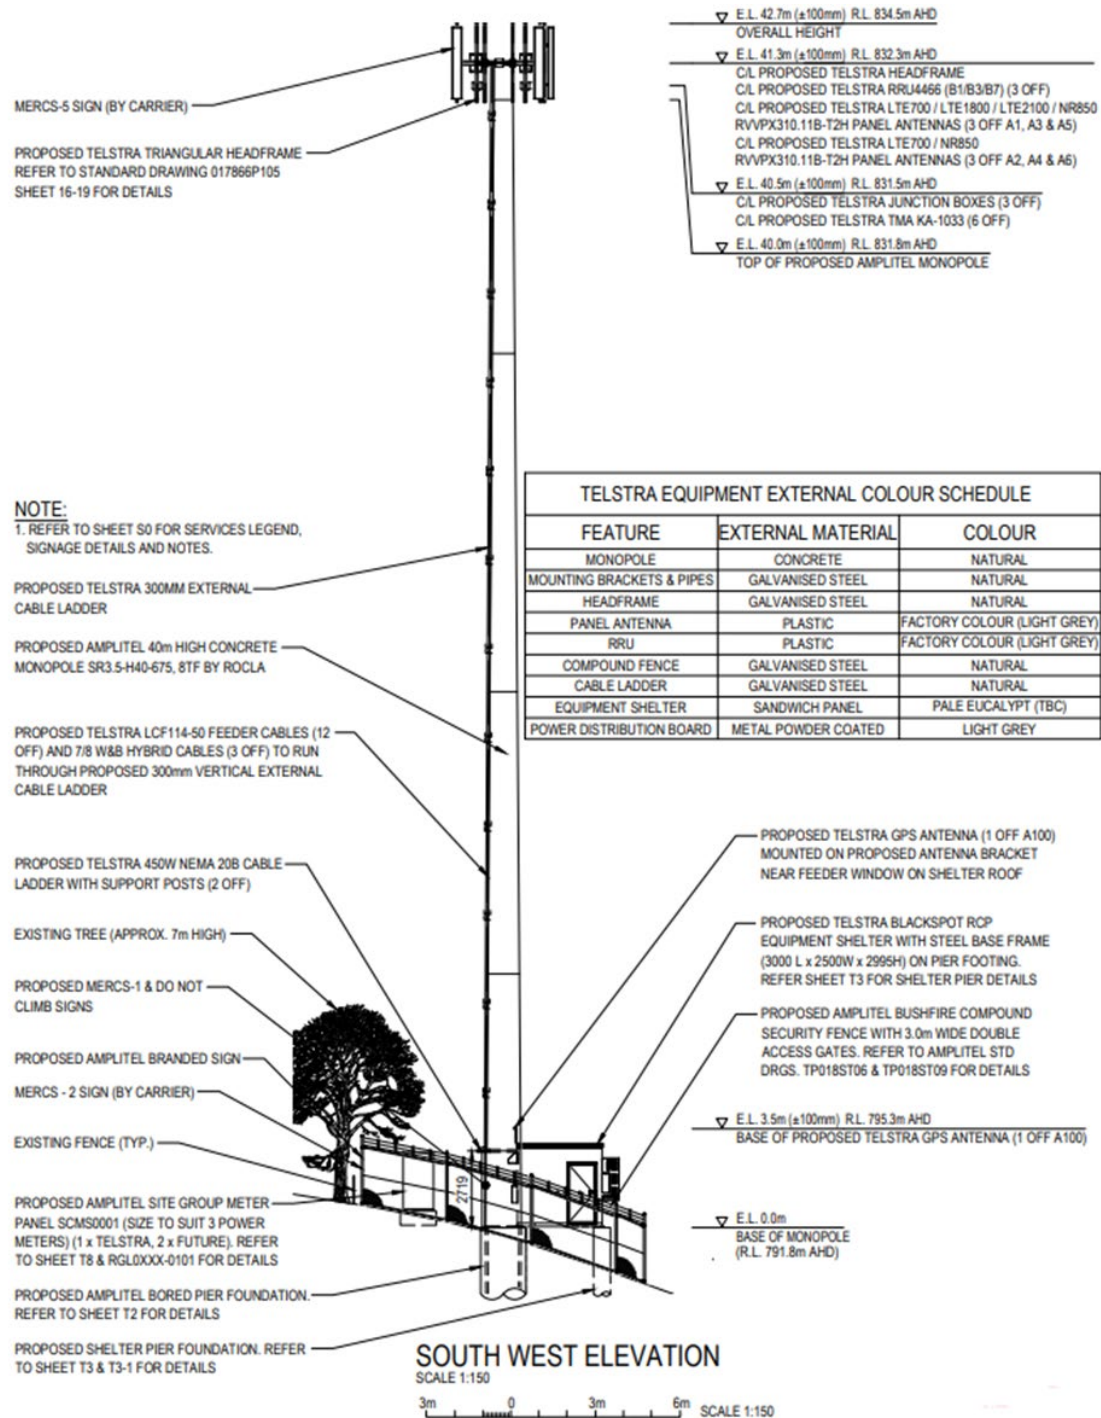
South-West Elevation Plan (Source: Decon Technologies)
